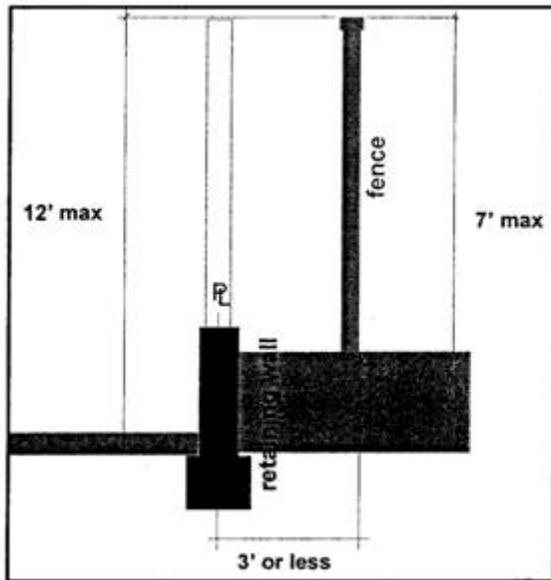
Fence Within Three Feet of Retaining Wall (Adjacent Owner Permission Required)
